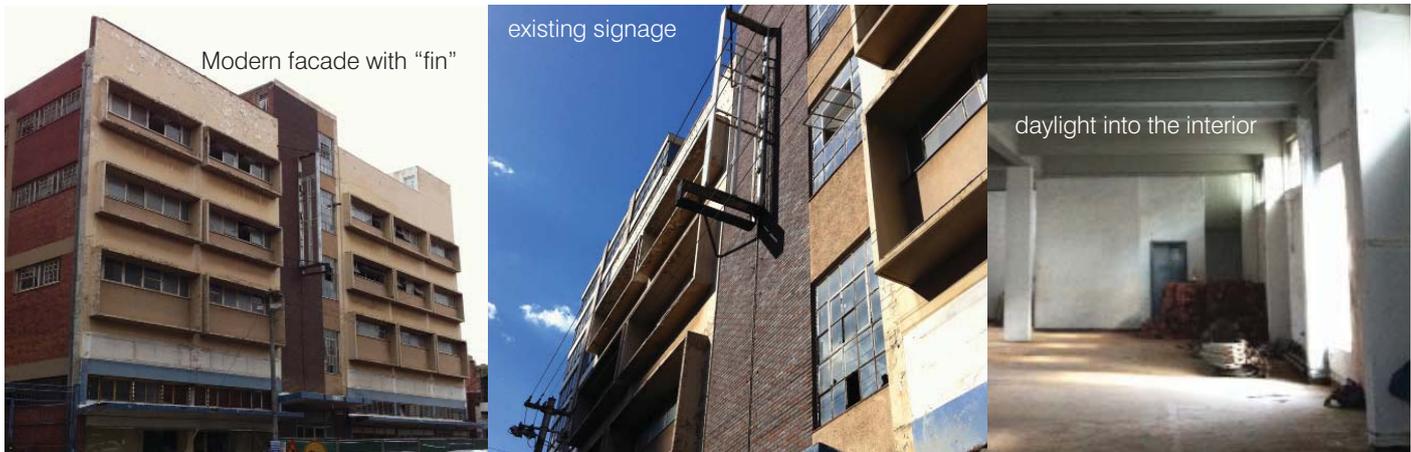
(above and opposite): Metro building (circa 1960), exterior and interior views (Author, 2011).
